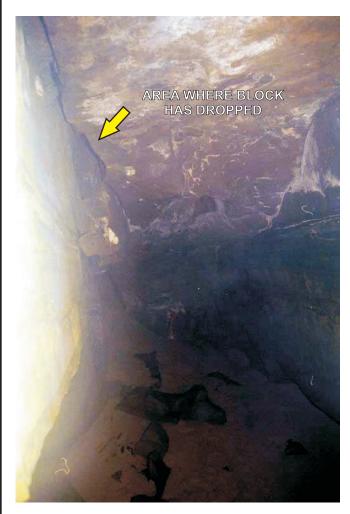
(2002) NOTE AREA PRIOR TO RECENT ROOF BLOCK FAILURE.
